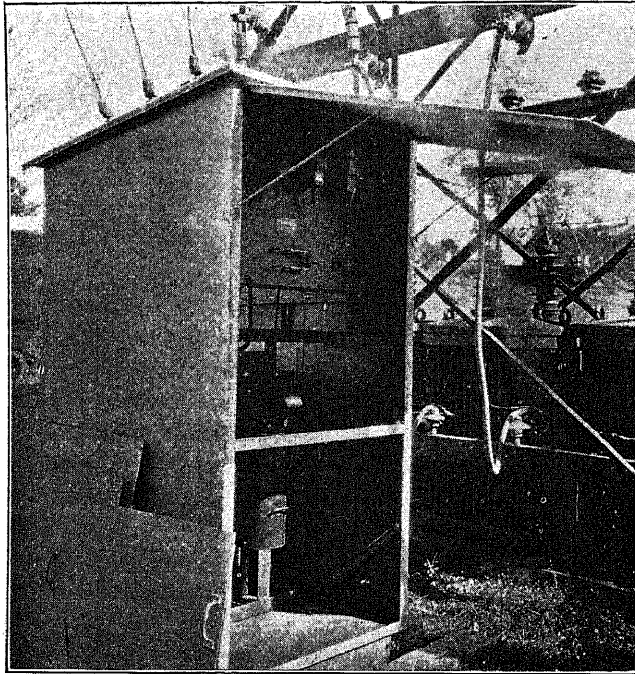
WEST BRANCH LIGHT AND POWER CO., STAMFORD N. Y. PRATTSVILLE SUBSTATION
